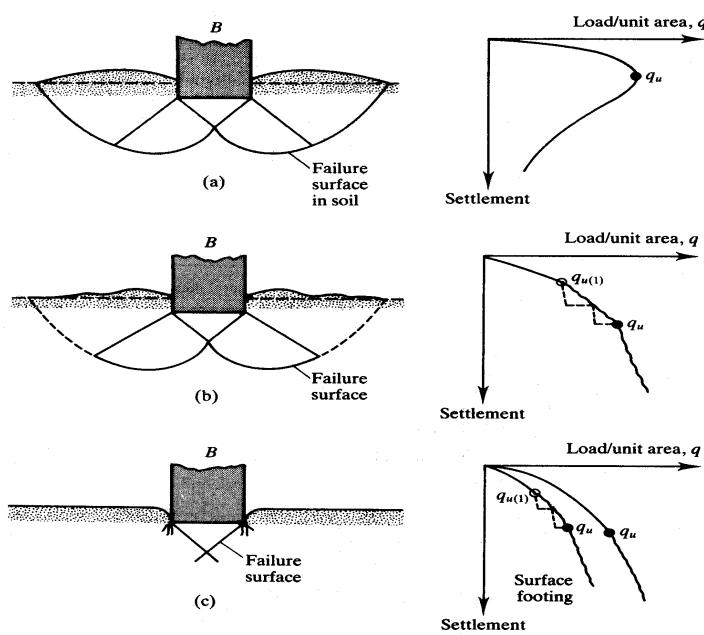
Modes of failure of model footings in sand. (After Vesic, 1963a, as modified by De Beer, 1970.)
